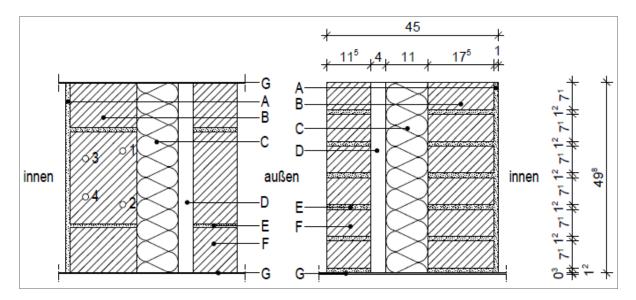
Composite wall construction; double shell masonry of sand-lime bricks with heat insulation; Left: horizontal cross section, Right: vertical cross section (A) Lime-cement plaster, (B) Sand-lime bricks (interior shell), (C) Mineral fibre insulation, (D) Air gap, (E) Cement mortar, (F) Fair-faced sand-lime bricks (exterior shell), (G) Steel plate
